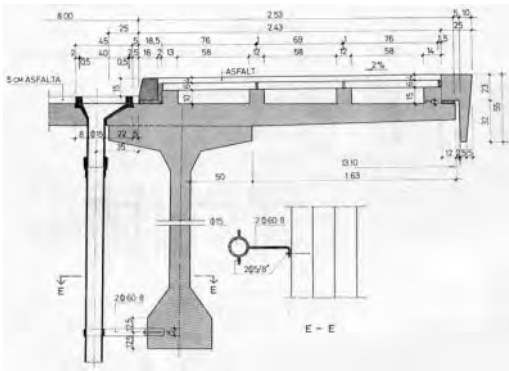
The pedestrian crossing over the bridge. Girder section, Detail. Source: Trojanović, p.134.
